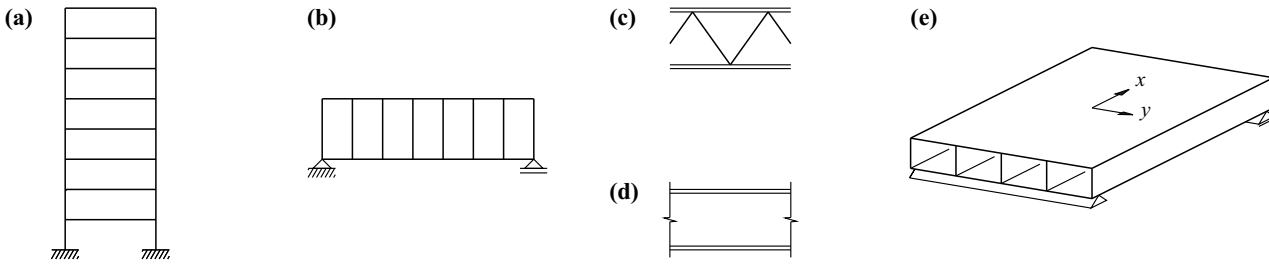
Beams in shear – examples: (a) multi-storey frame, (b) VIERENDEEL girder, (c) trussed girder, (d) sandwich panel, (e) hollow slab
